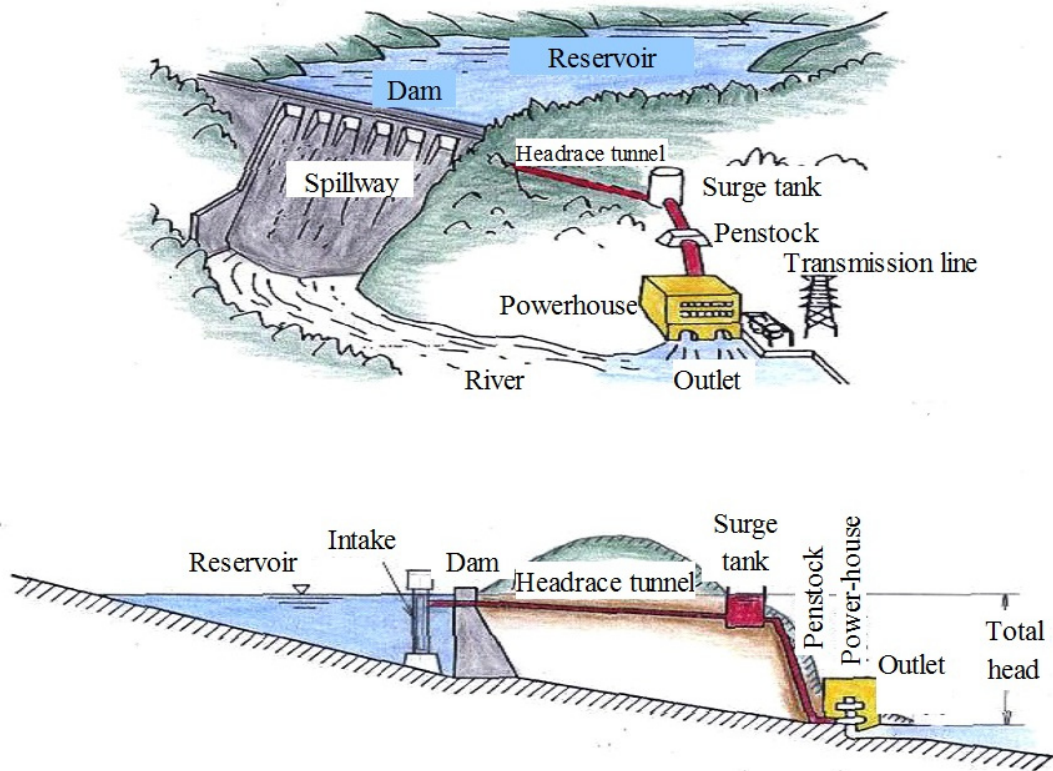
Major Structures of a Hydropower Project (Source: JEPIC, 2008)
